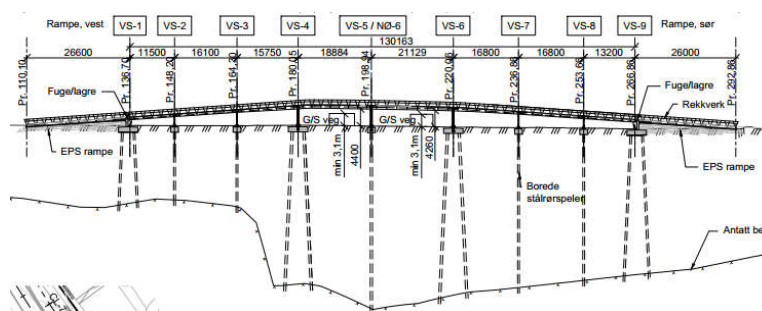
Longitudinal section for the bridge, stretching from the west end to the south end.
